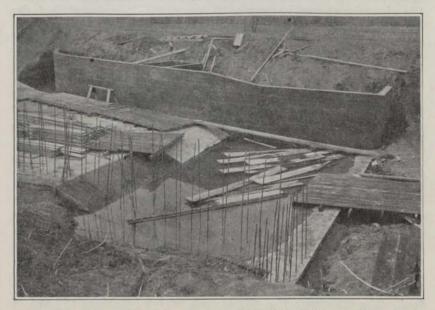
Partly completed reinforced concrete 20-foot Parshall Measuring Flume on the Bijou Canal, South Platte River, near Greeley, Colo.
